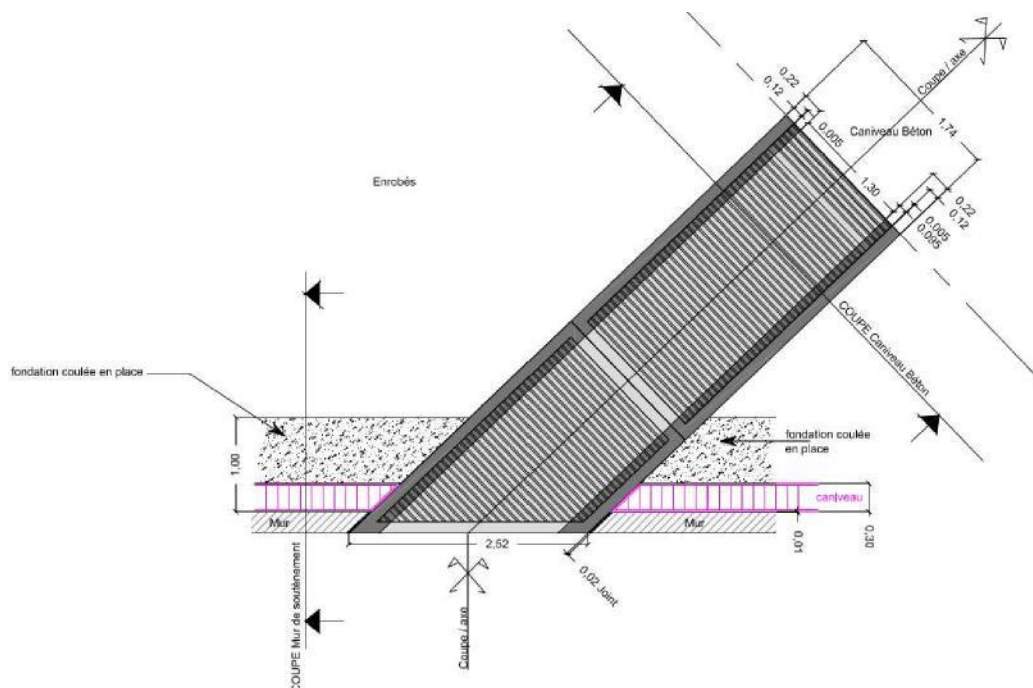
Plan of the concrete culvert under the heavy roadway between QR5 and the EMR quays [25].
